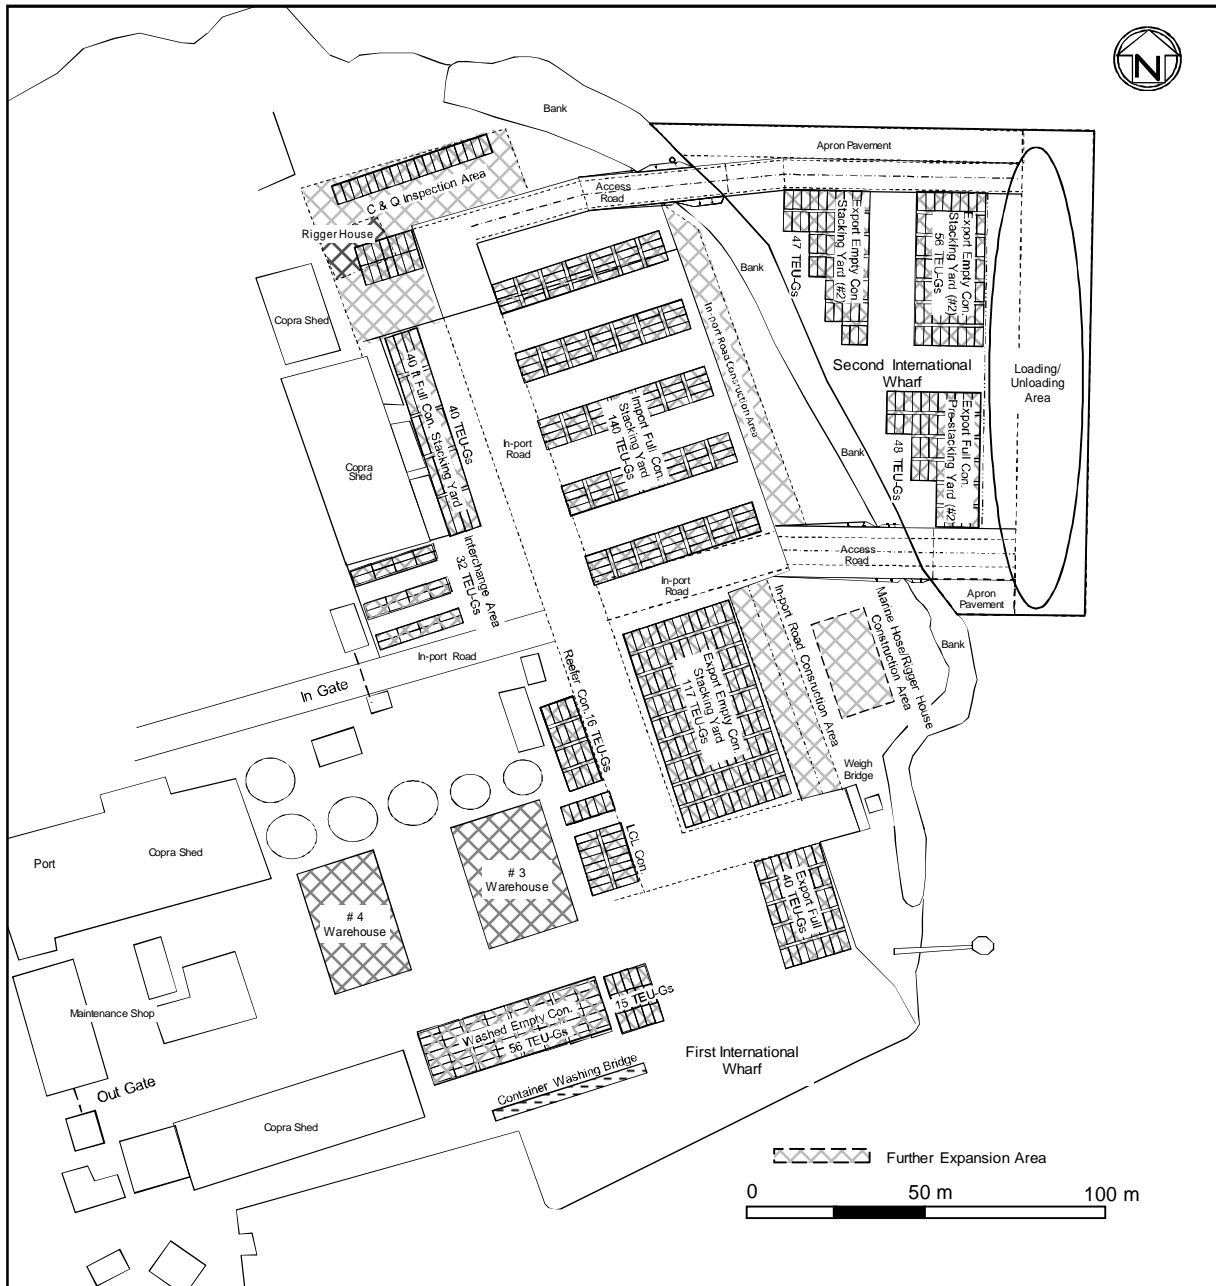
Yard Layout Plan with No.2 International Berth
